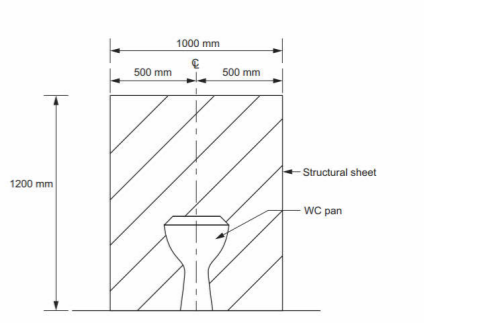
Location of sheeting for a wall behind a toilet pan
